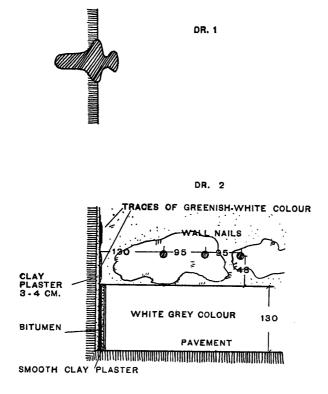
L5, Dr. 1, section of wall-nail in position. L5, Dr. 2, section and elevation of southwestern wall showing wall-nails in position.
